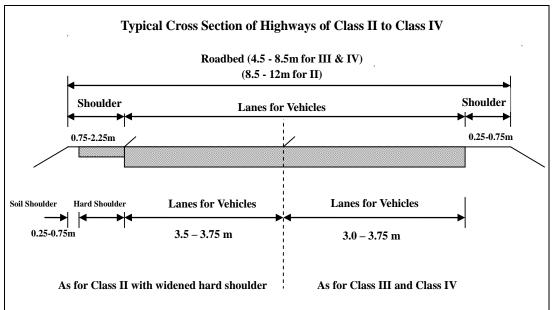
Typical PRC Class II, III and IV Road Cross Sections and Right of Way (plus ≥ 1 m on each side for safety)
